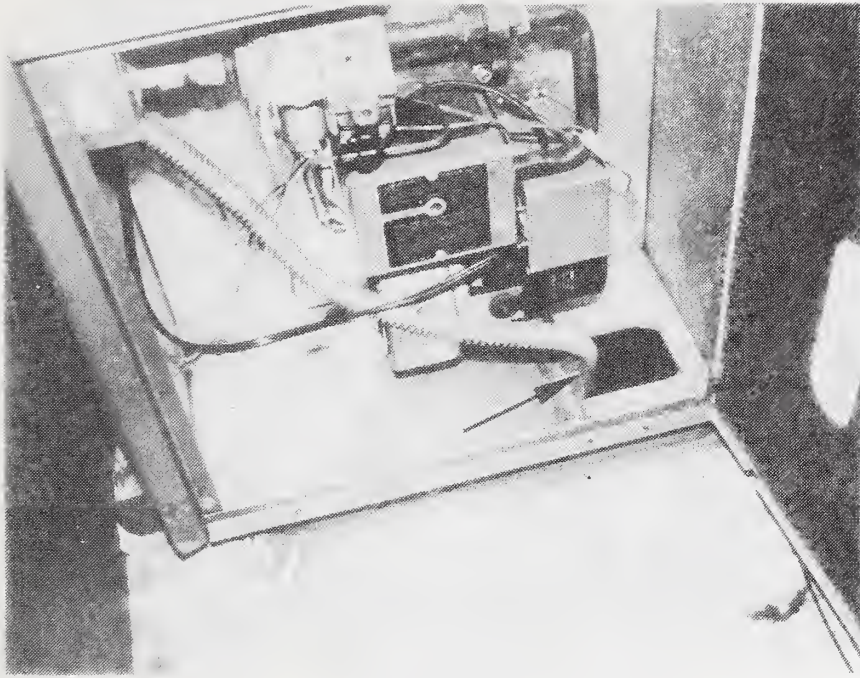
Flexible Gas Connector on Furnace Through Floor to Gas Supply Piping
